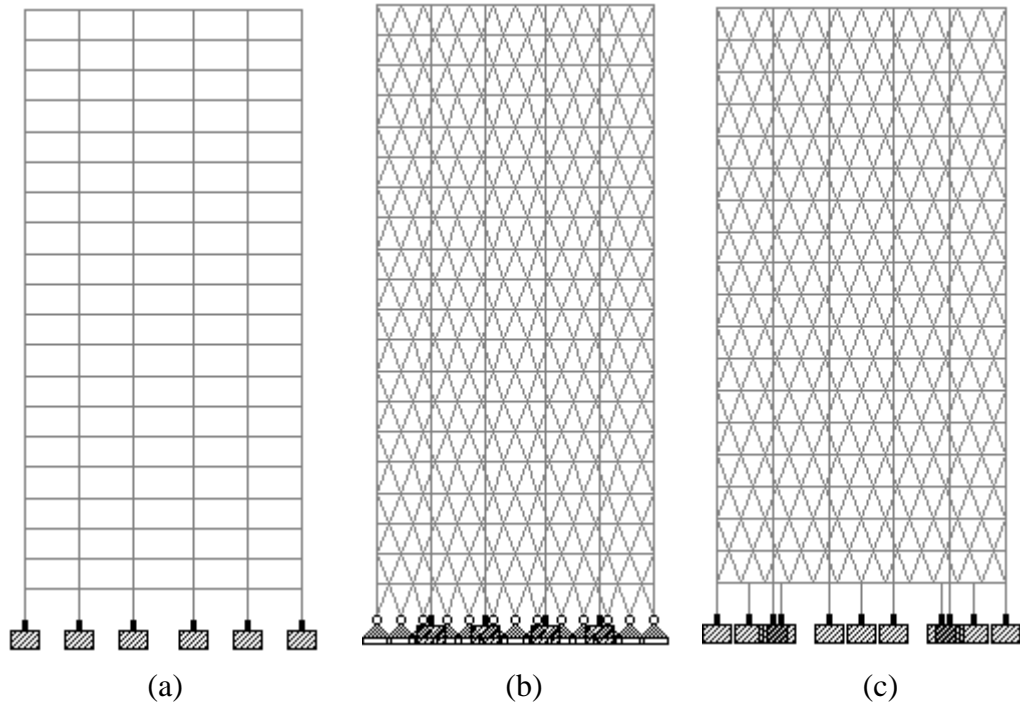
Building Models (a) Simple Frame Structure, (b) Full Diagrid Structure, (c) Modified Diagrid Structures with Vertical Base Columns
